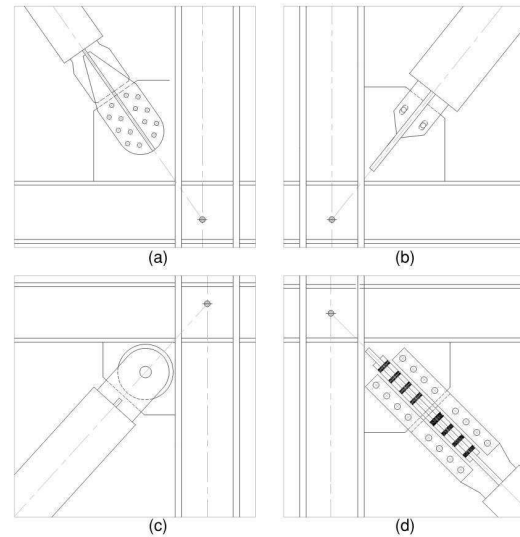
Schematic showing sample of BRBs with (a) bolted lug, (b) welded, (c) pinned, and (d) bolted splice plate connections. (Courtesy CoreBrace, LLC)
